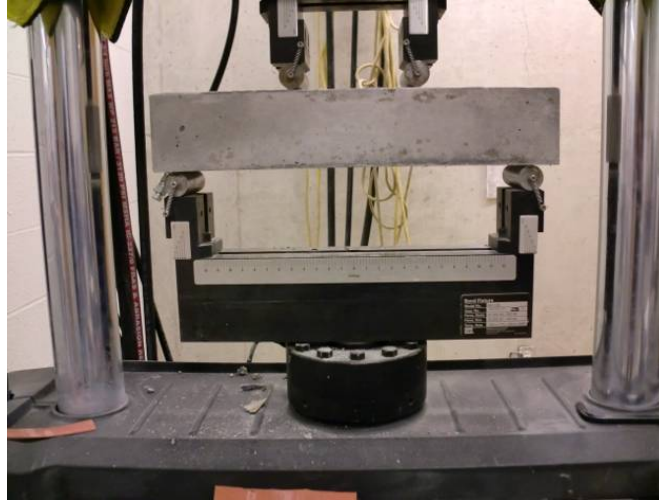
Flexural test (4- point loading) of LWSCC beams
